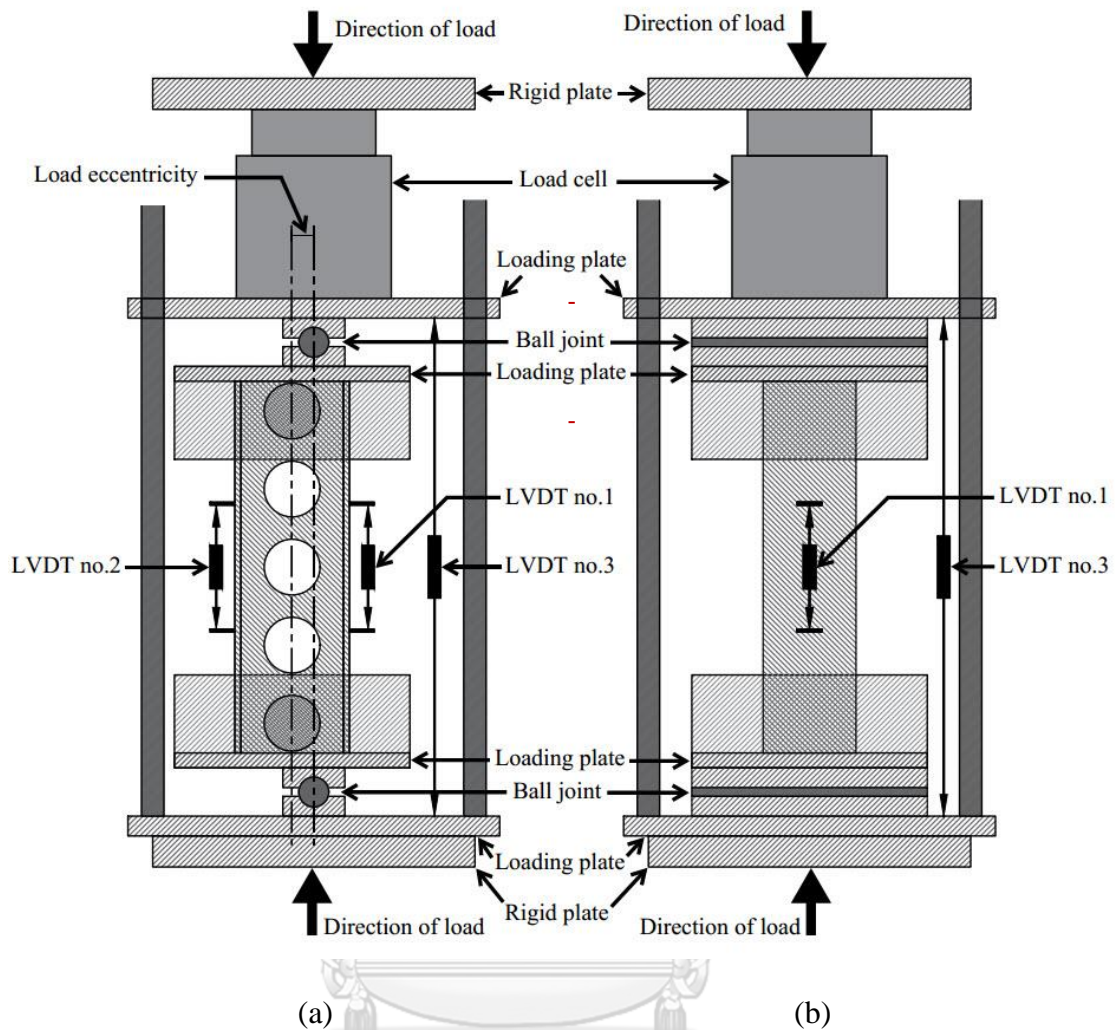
Static test setup of steel column under eccentric loads; (a) side view; and (b) front view.
